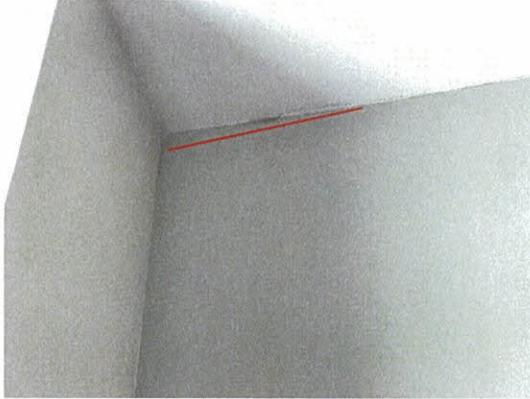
Crack at wall to ceiling interface from building movement caused by the forces exerted on the building envelope by the Hurricane.
